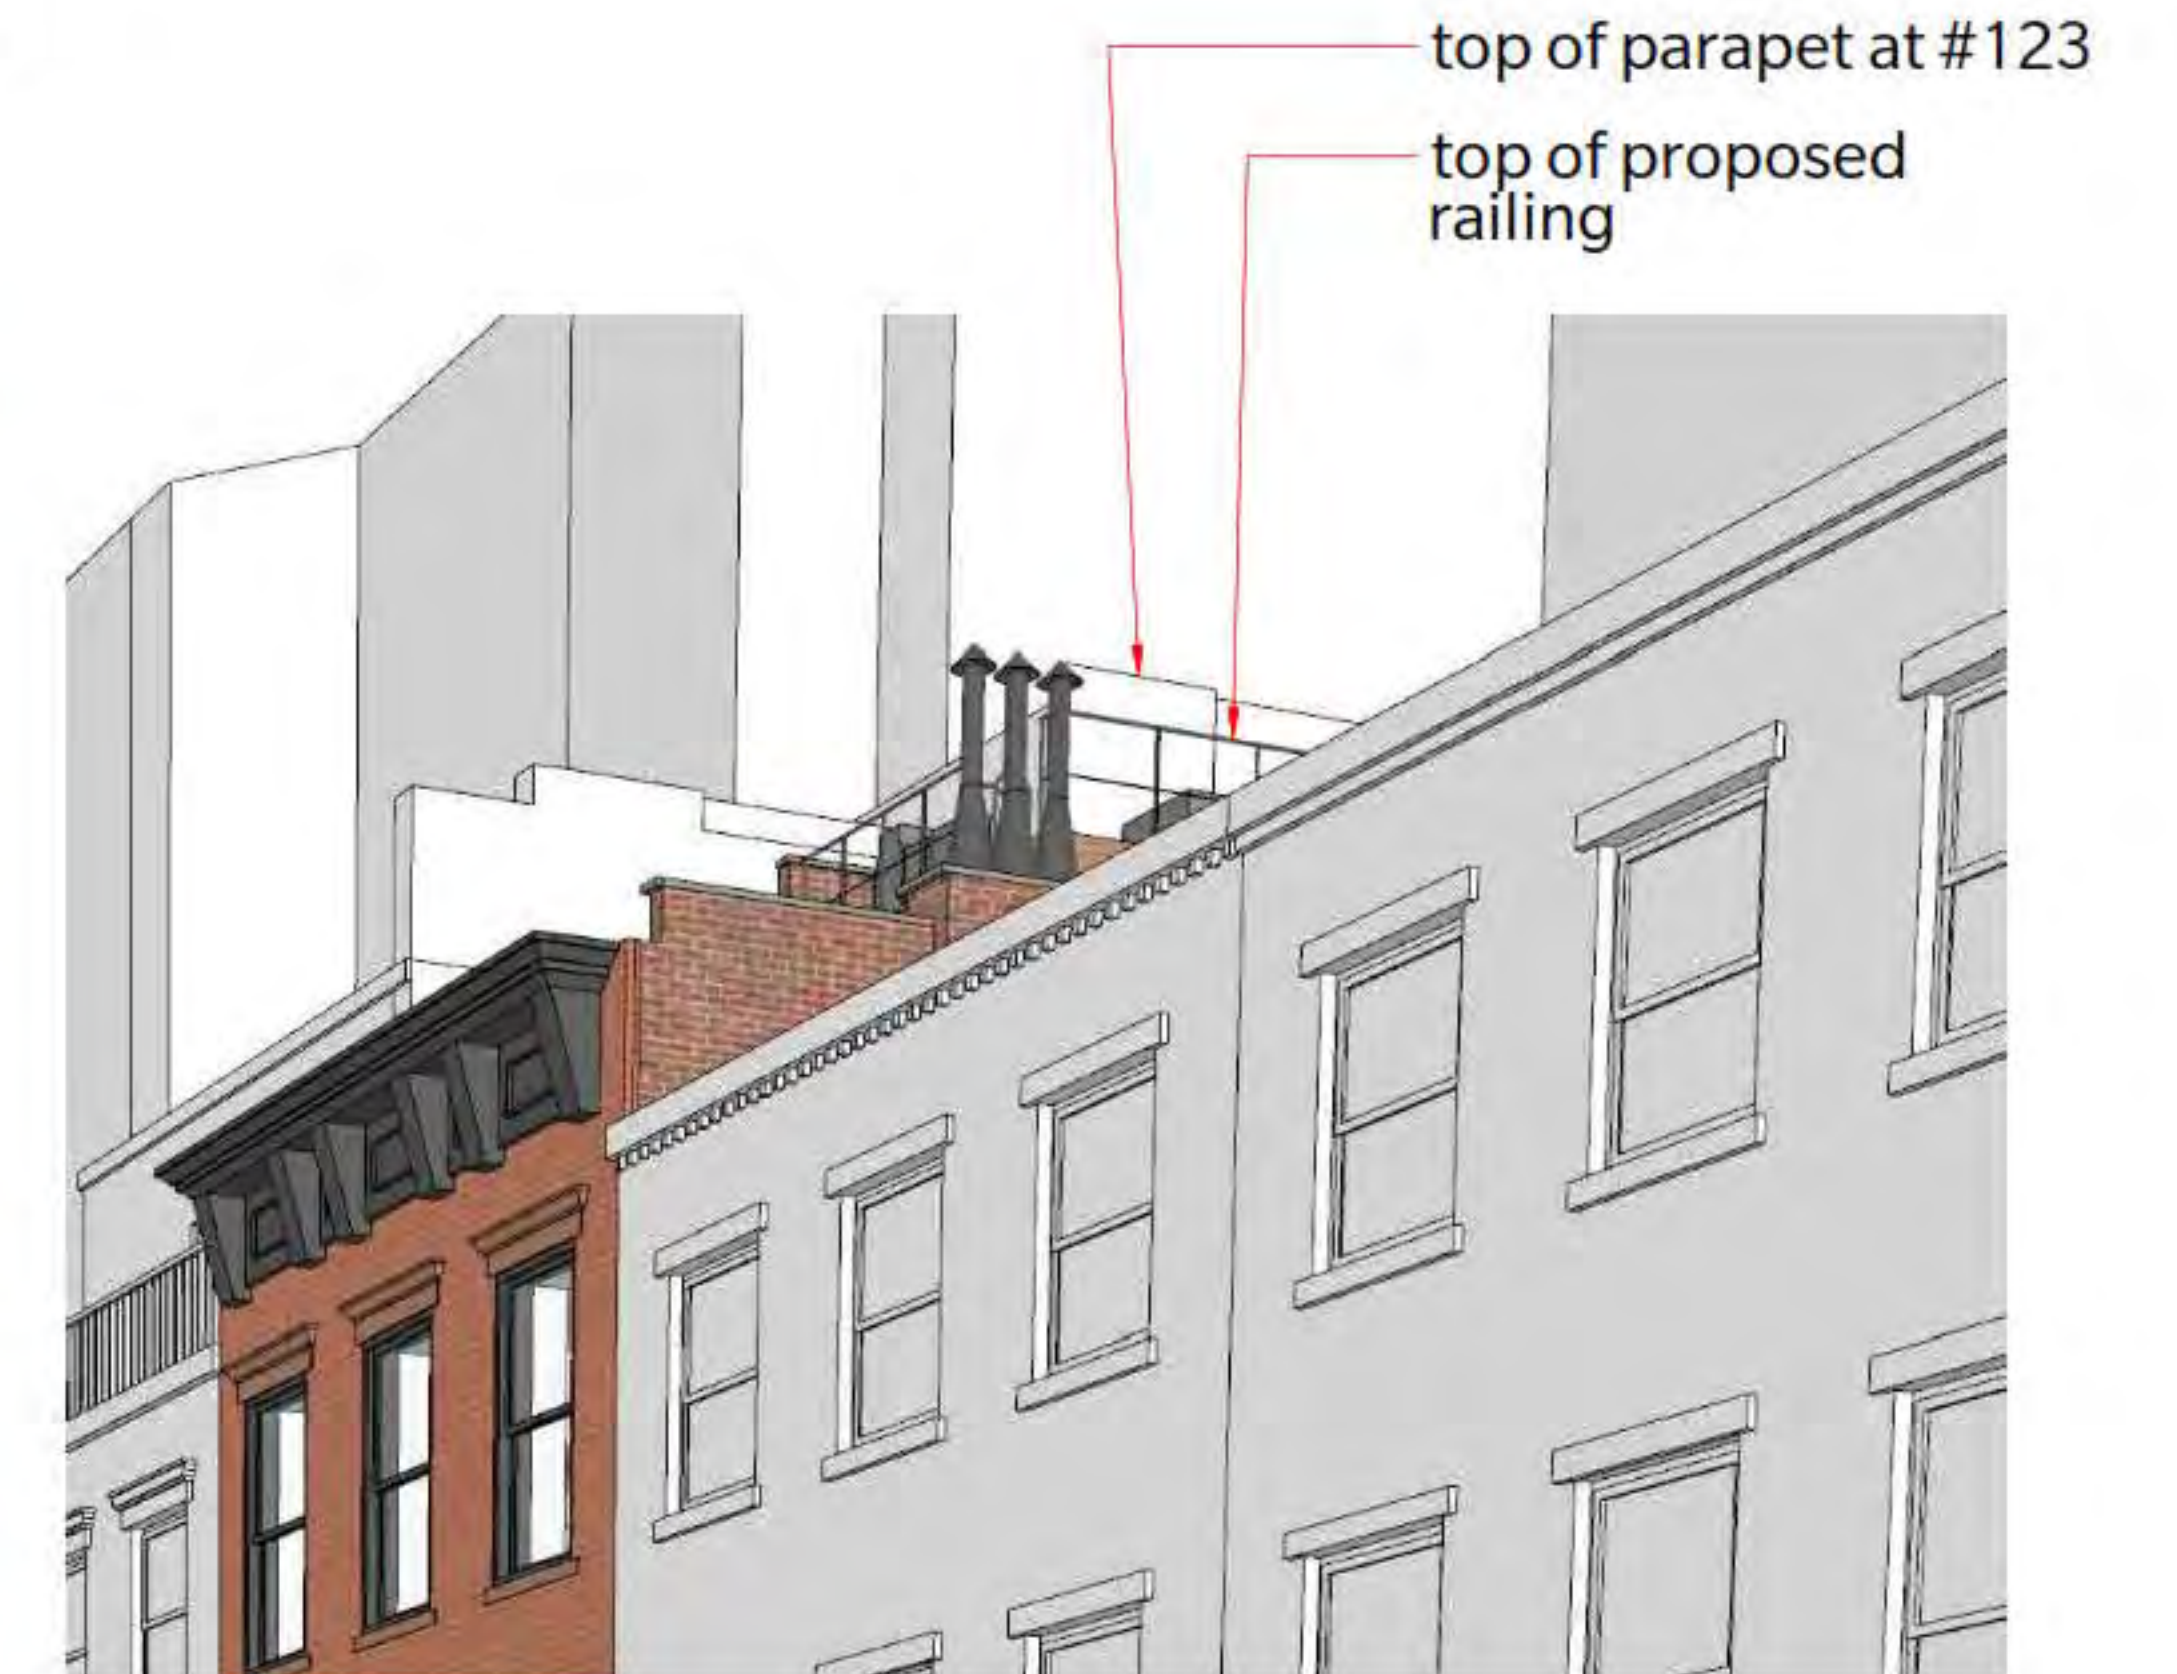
PHOTOS OF ROOF MOCKUP (STREET VISIBILITY)
